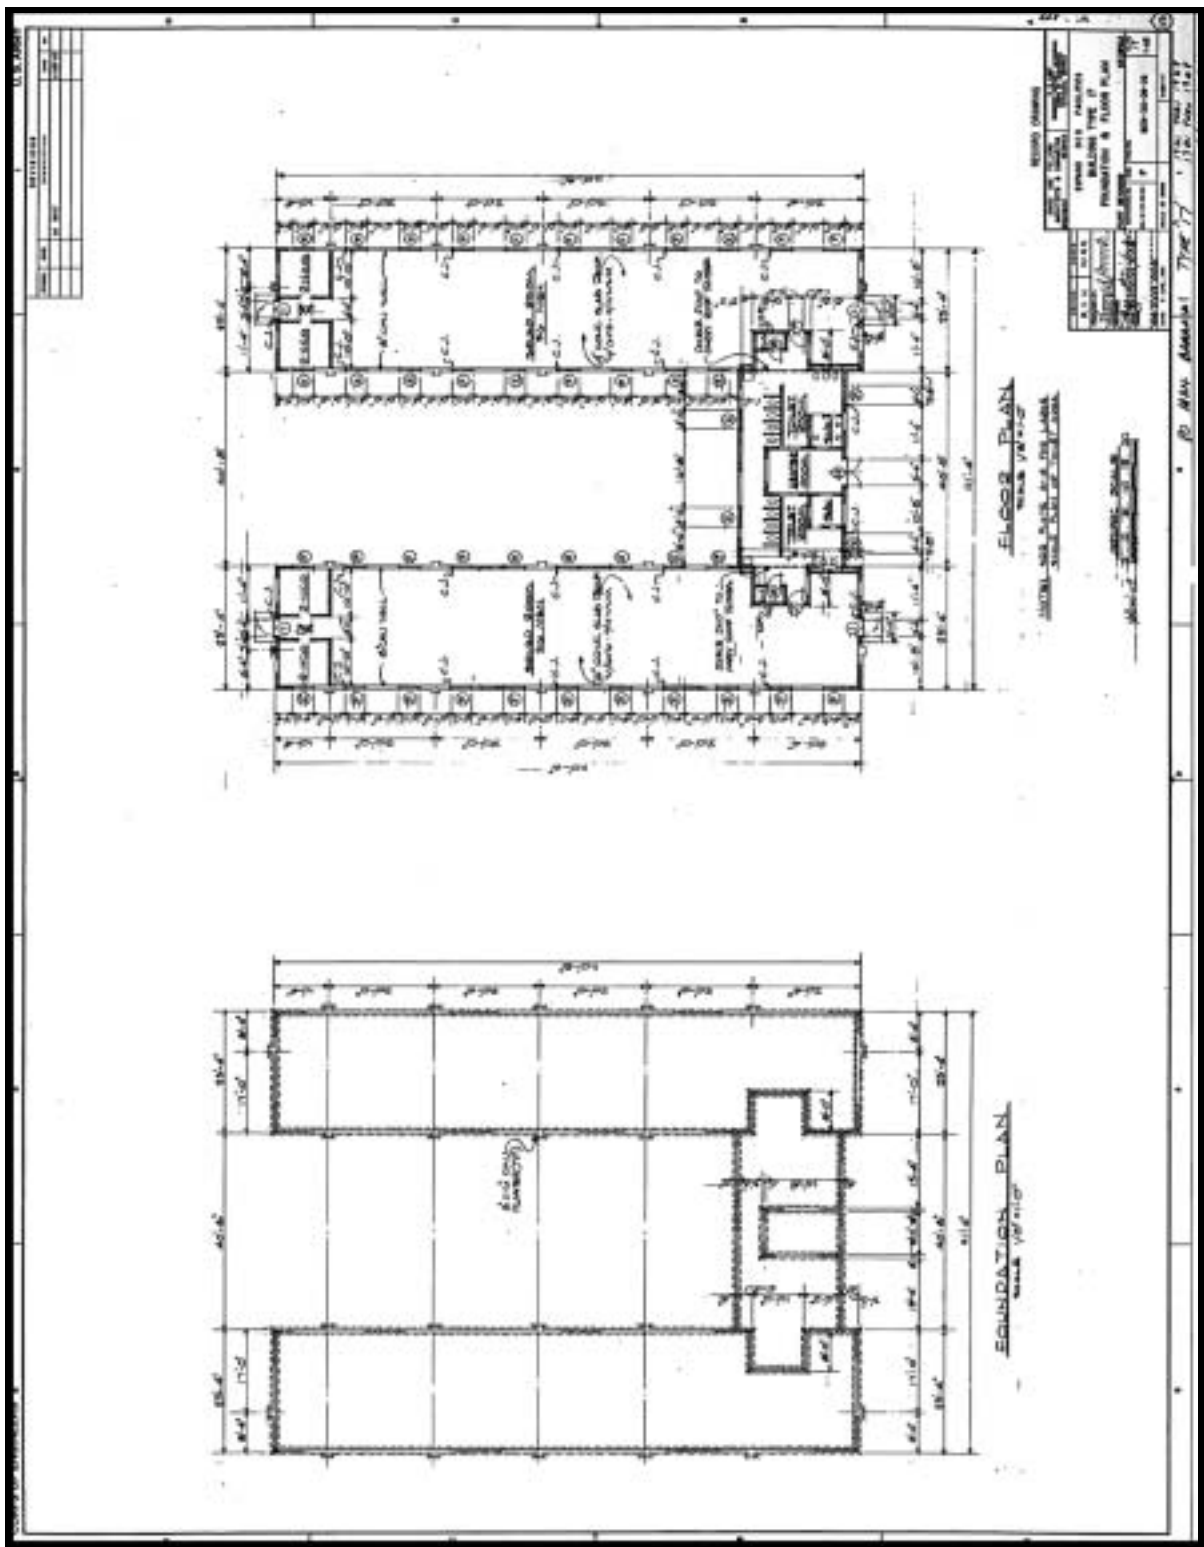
Semi-permanent 72-man "U" barracks, floor plan, Ft. Benning (1964, as built 1967) (Engineering, Ft. Benning).
